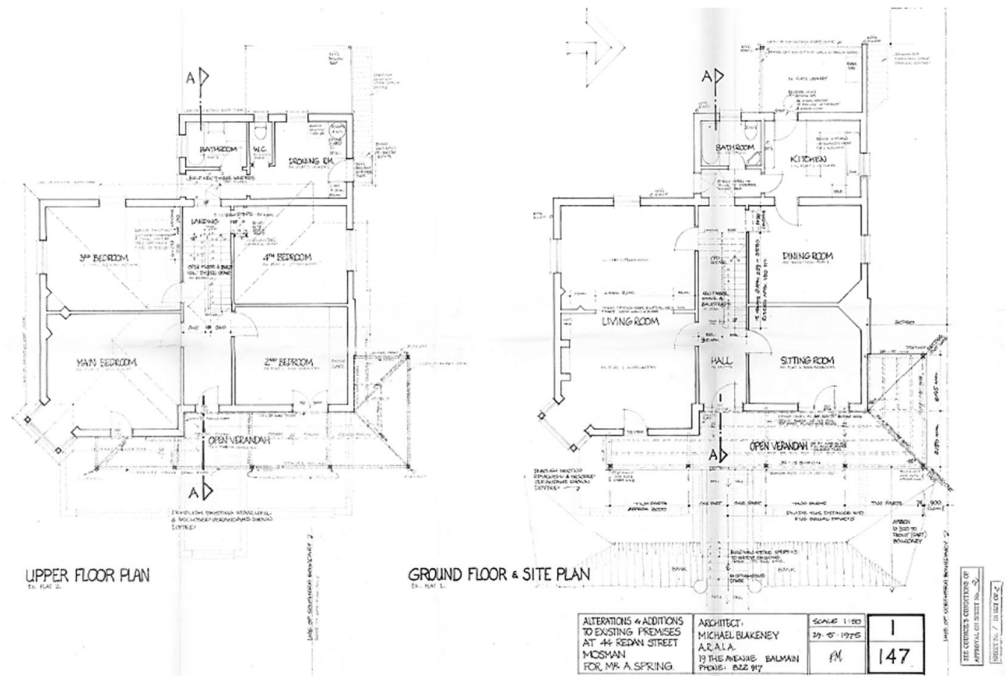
Approved plans from 1975 to convert flats into a dwelling.
